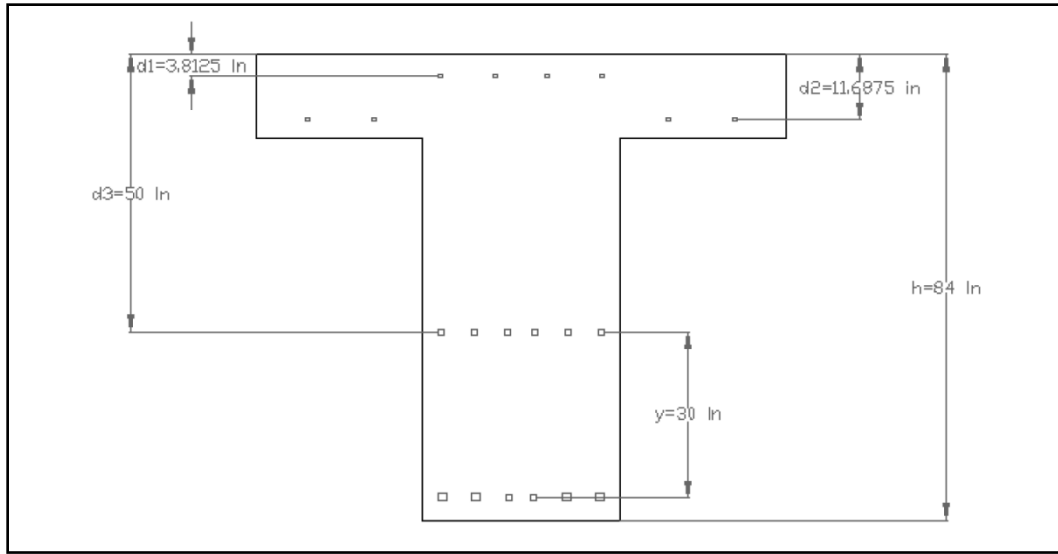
Cross section of the interior beam at end-span, steel rebar location.
